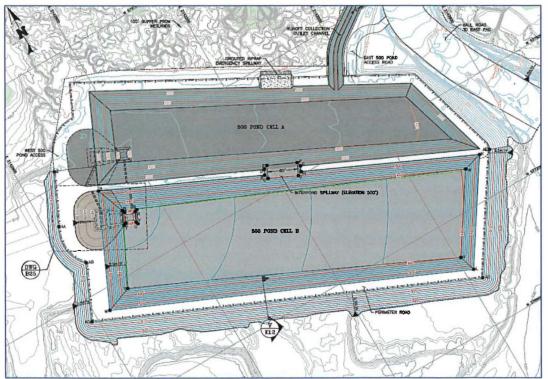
500 Pond Detailed Plan View with Pump Stations
